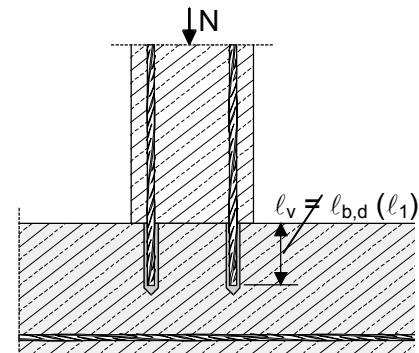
Rebar connection for components stressed primarily in compression. The rebars are stressed in compression
